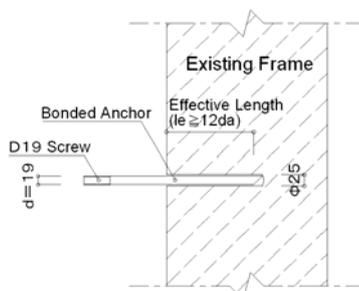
Embedded Length of Bonded Anchor Used in S-RC Brace
